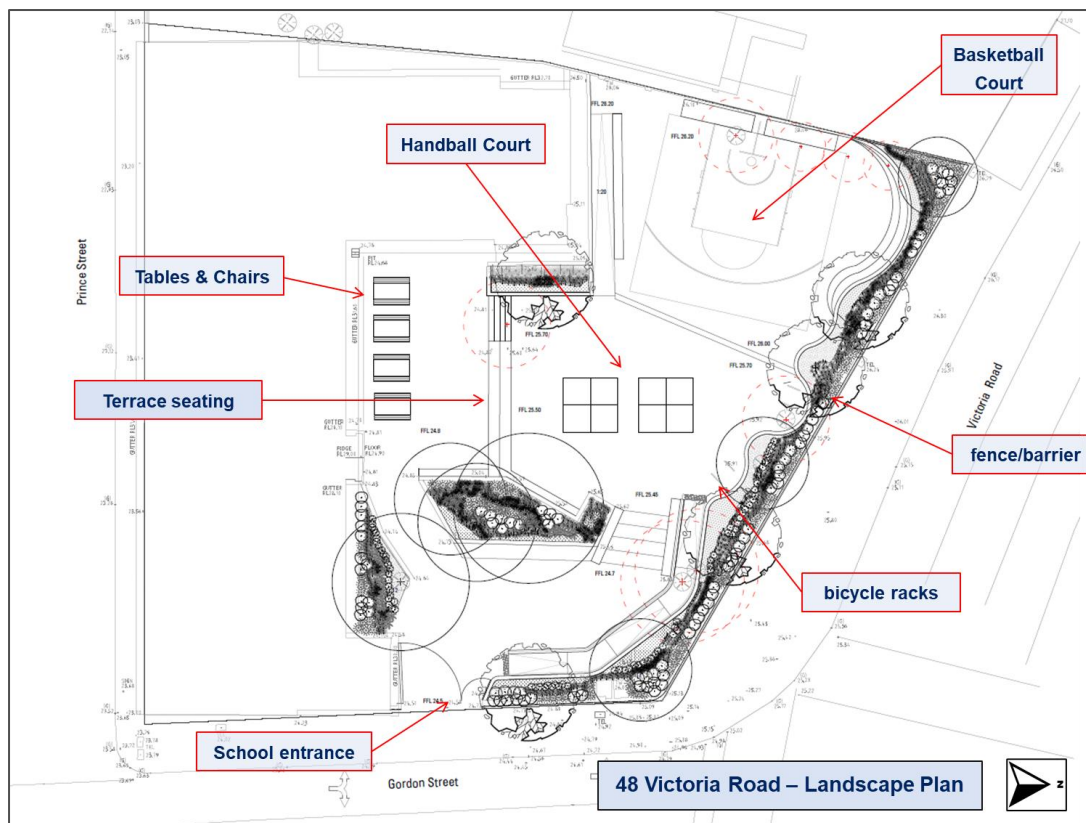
| Proposed landscaping at Victoria Road site (Source: Applicant's EIS 2021)
